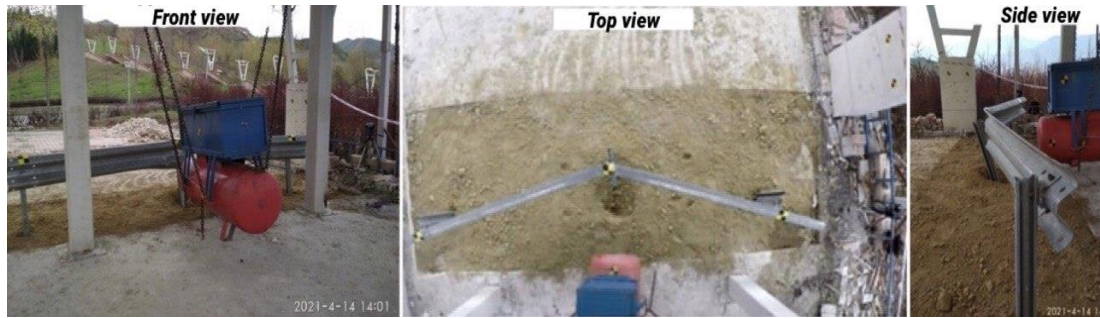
Deformation shape of w-beam guardrail after crashing with pendulum.
